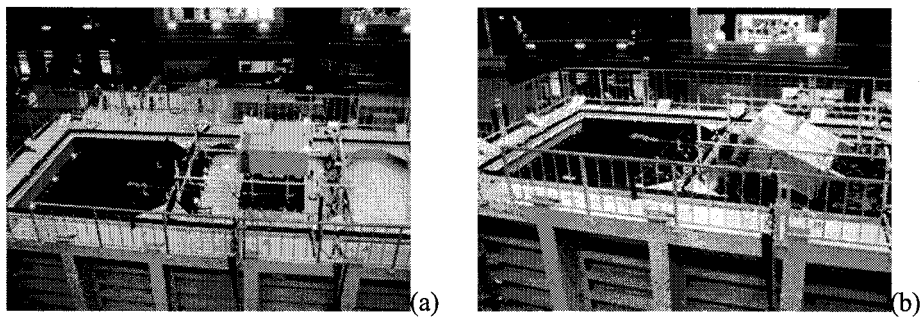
Quay wall and pile structure (a) before shaking and (b) after test completion.
